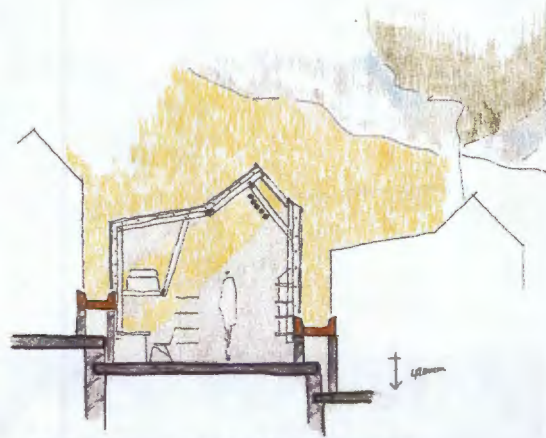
Concept section: Vertical expansion (by author 2010)
